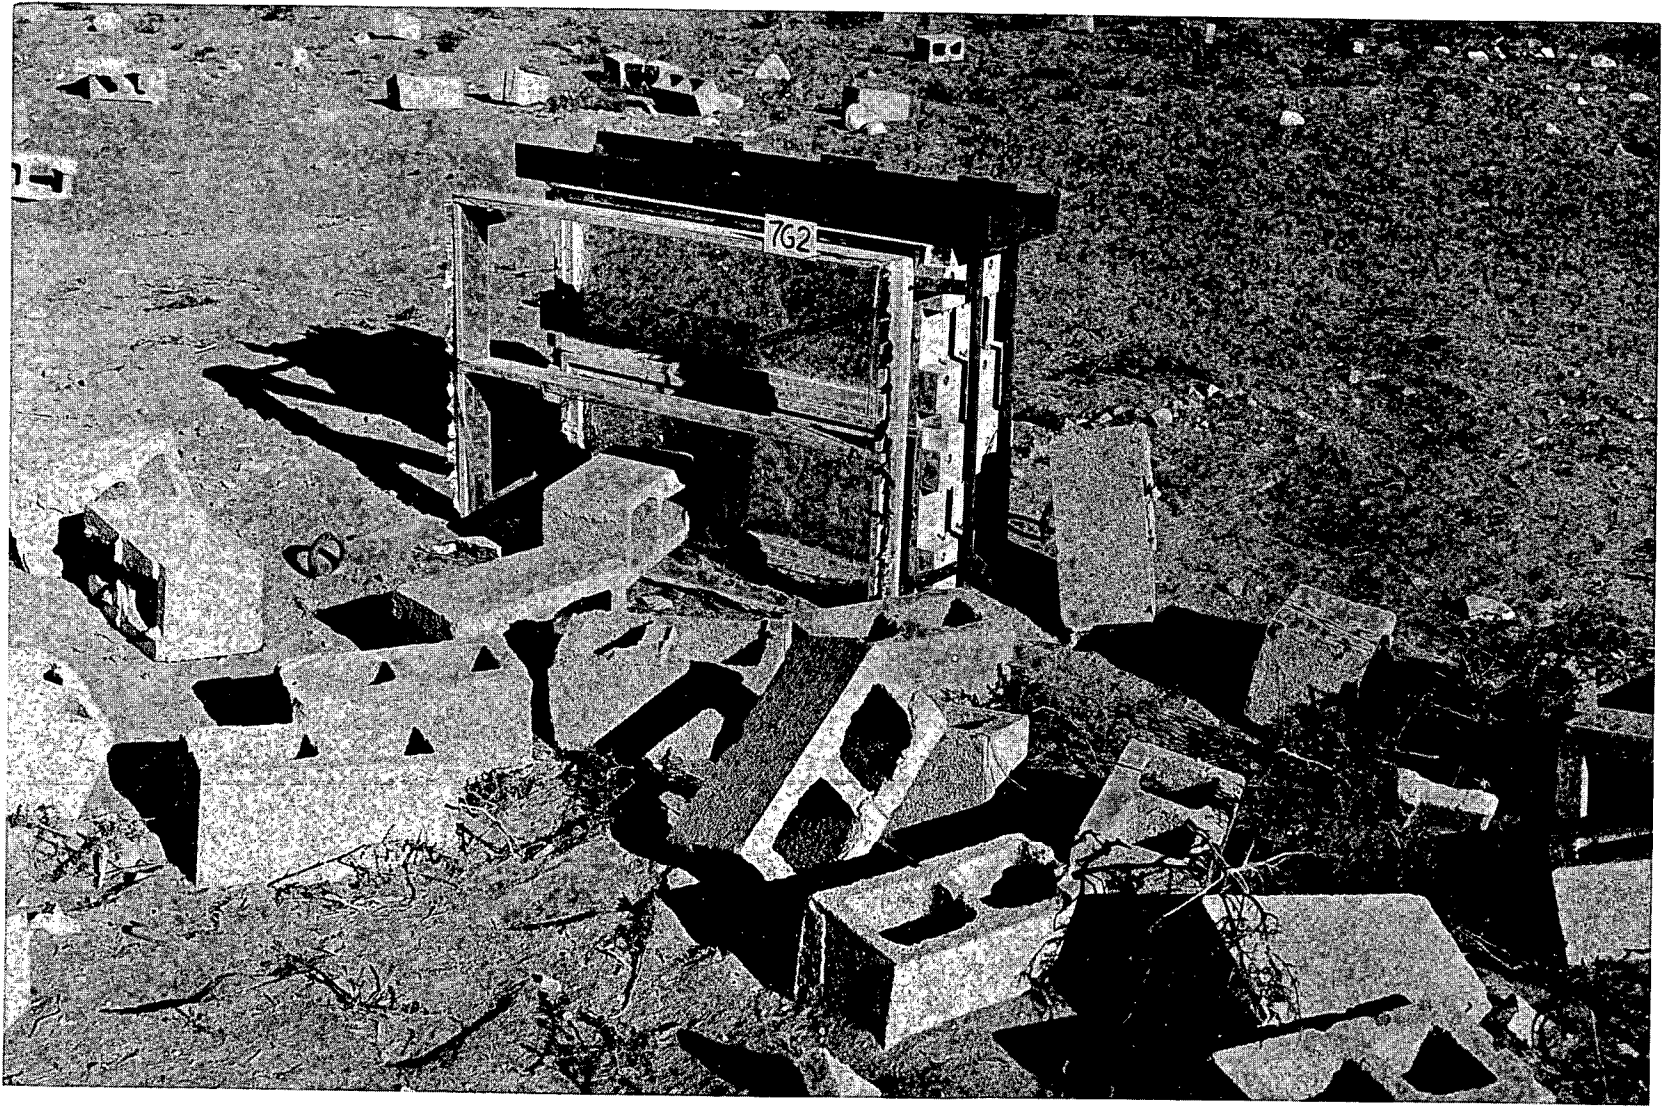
Traps 7G2a and b, 40.2 ft behind the concrete-block wall, postshot.
